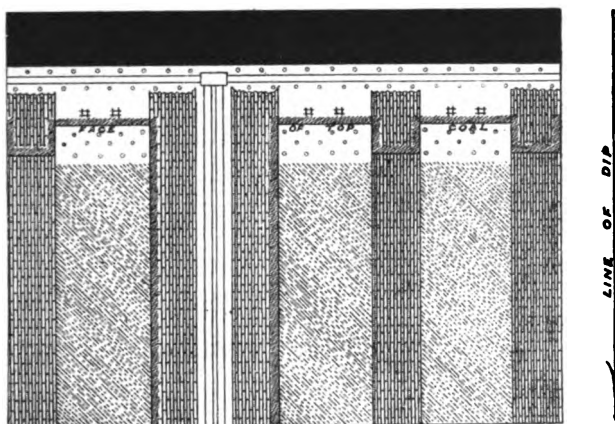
GREAT FENTON COLLIERIES, STOKE-UPON-TRENT. PLAN OF LONGWALL FACE IN THE GREAT ROW COAL SEAM, SHOWING PROPS AND CHOCKS.
